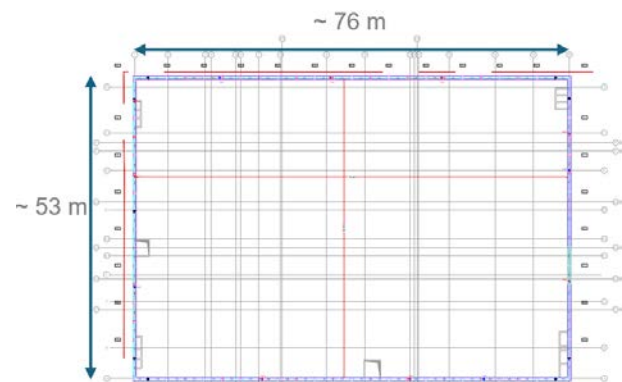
Plan view of the M-Lyon Building diaphragm wall
